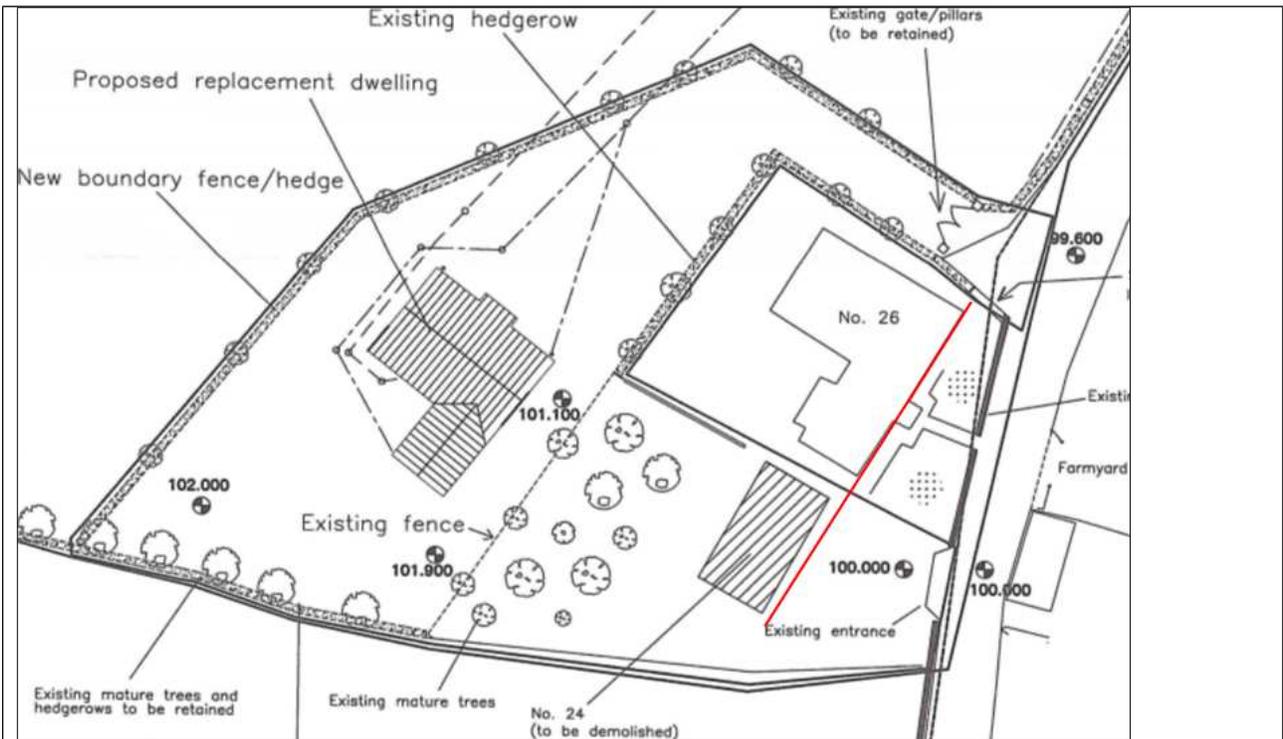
Block plan showing no. 26 applicant’s home and no. 24 building to be replaced.
